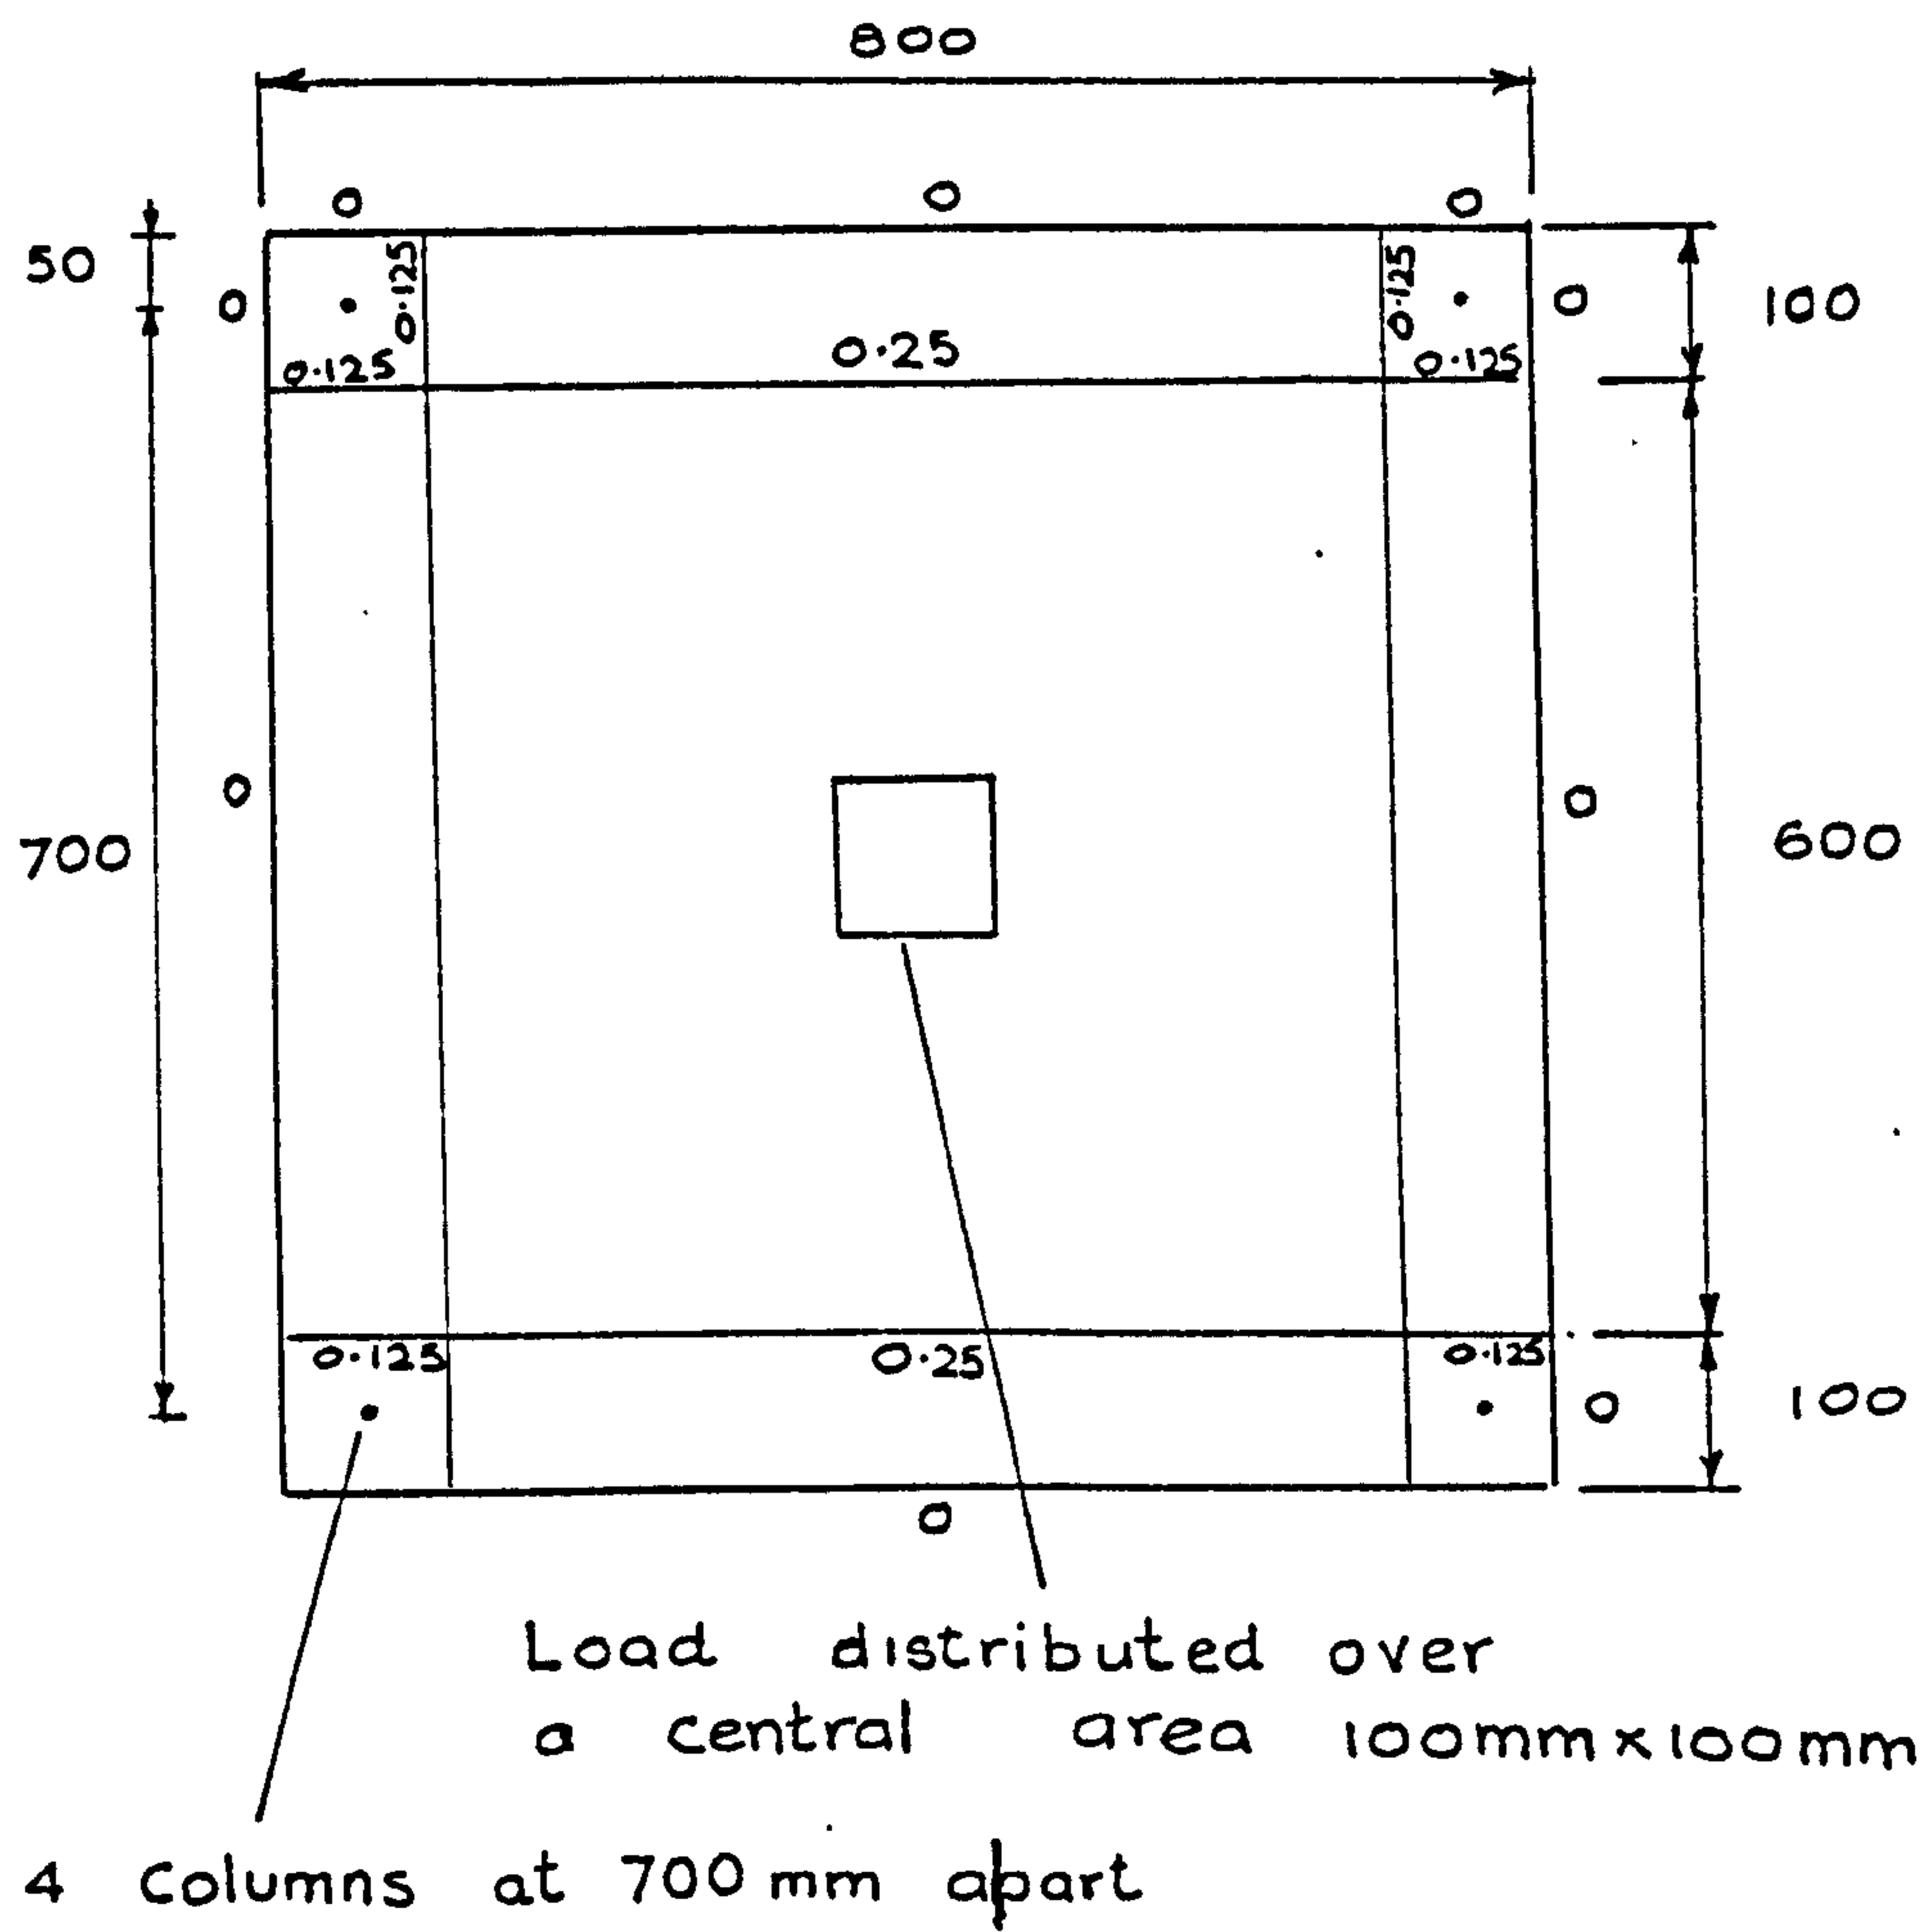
STRIP LAYOUT, POSITION OF COLUMNS AND VERTICAL SHEAR FORCE
